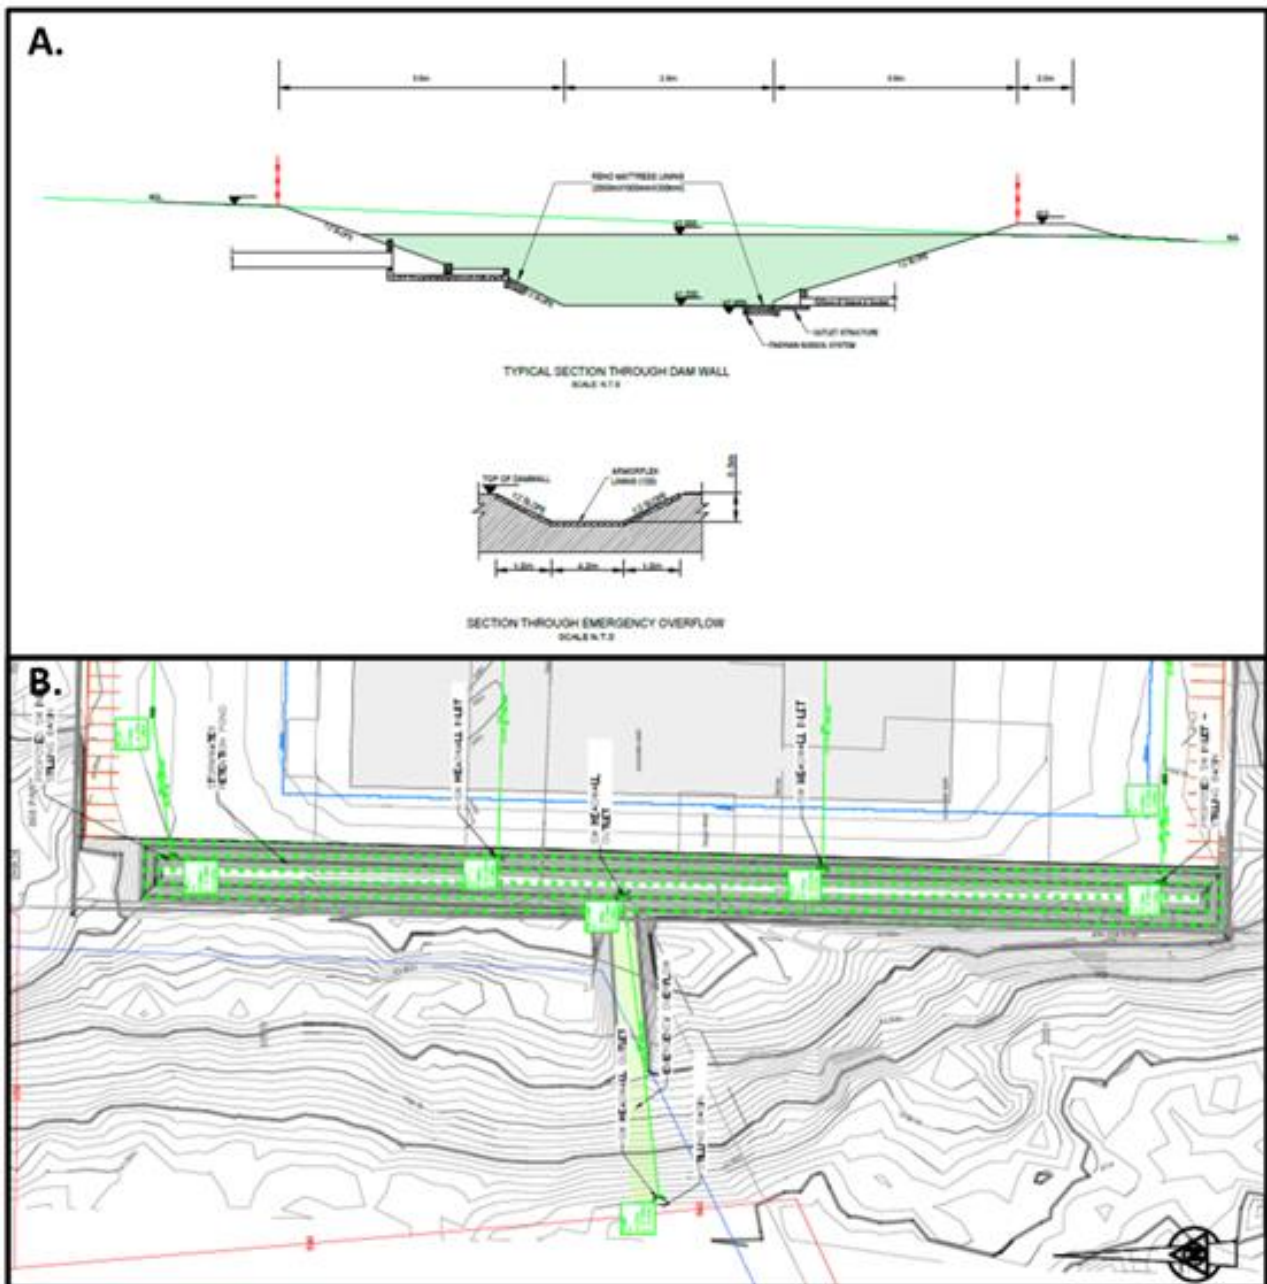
Extracts from the stormwater management plan's attenuation pond design, showing, A) a cross section of the pond and B) a map of its location against the site's western boundary (From KLS Consulting Engineers (2022)).
